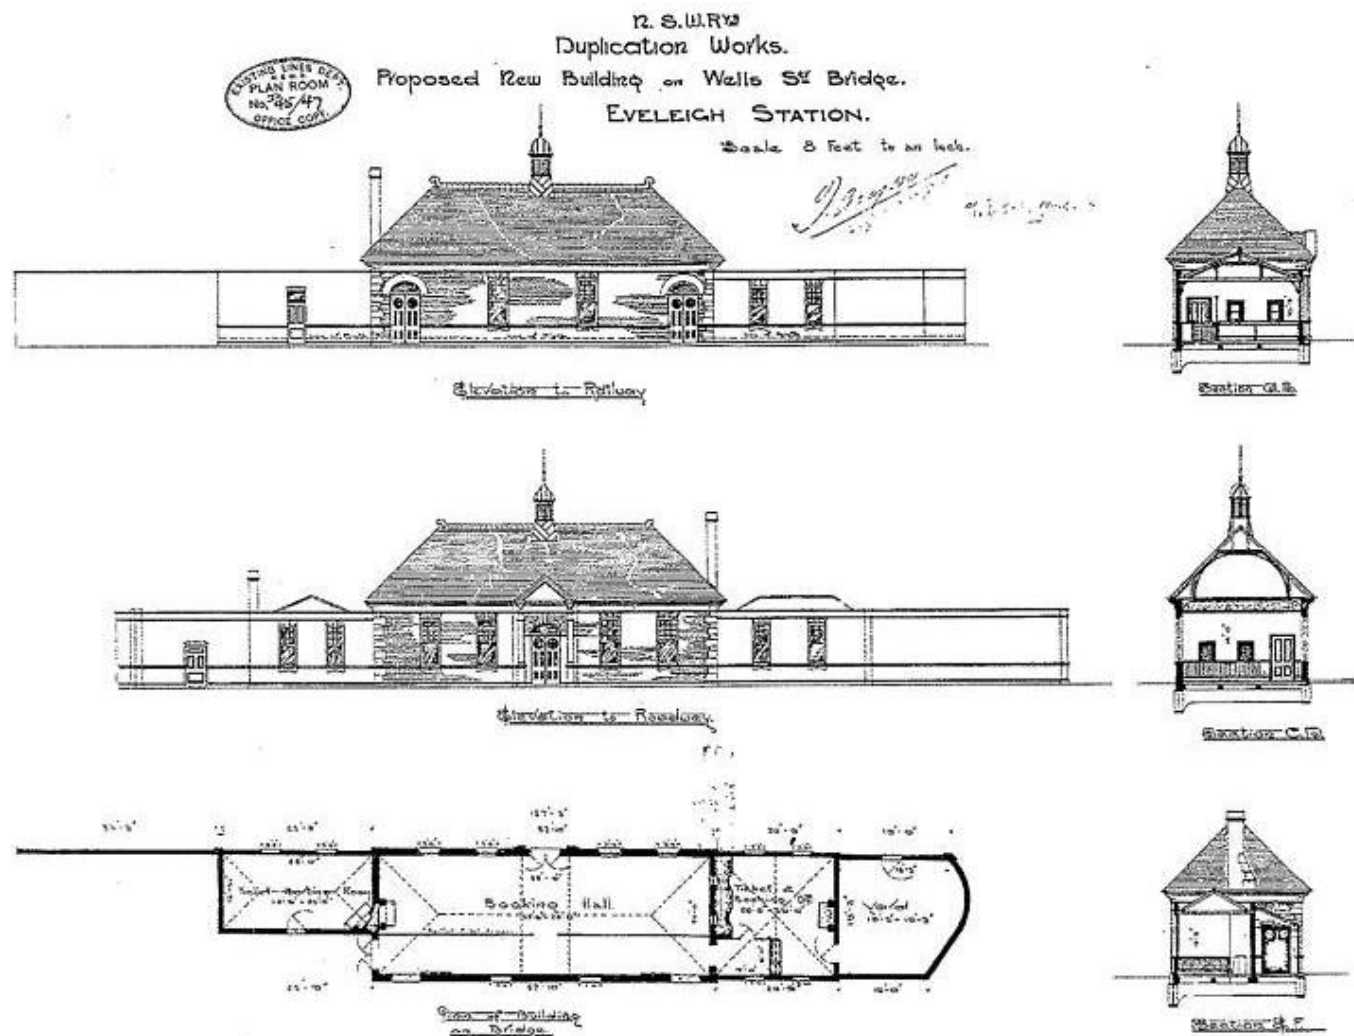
Proposed new building - Wells Street Bridge, Eveleigh Station, c1891. Source: State Rail Archives, State Records
